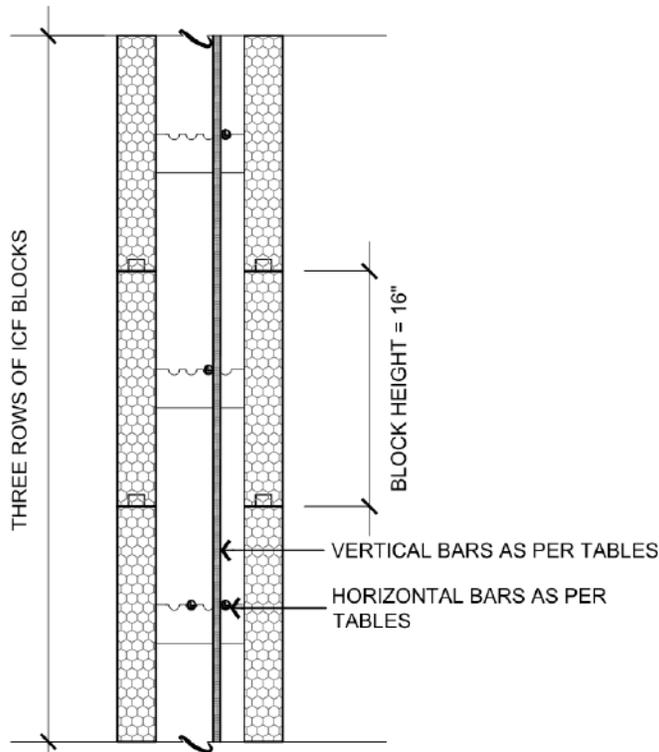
Above Grade Wall Reinforcing Placement for 12" Thick Walls.
